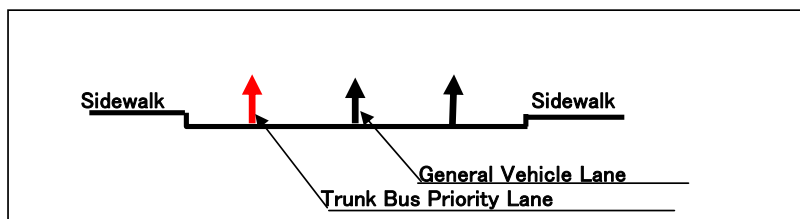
Typical Cross Section of Trunk Bus Priority Lane
